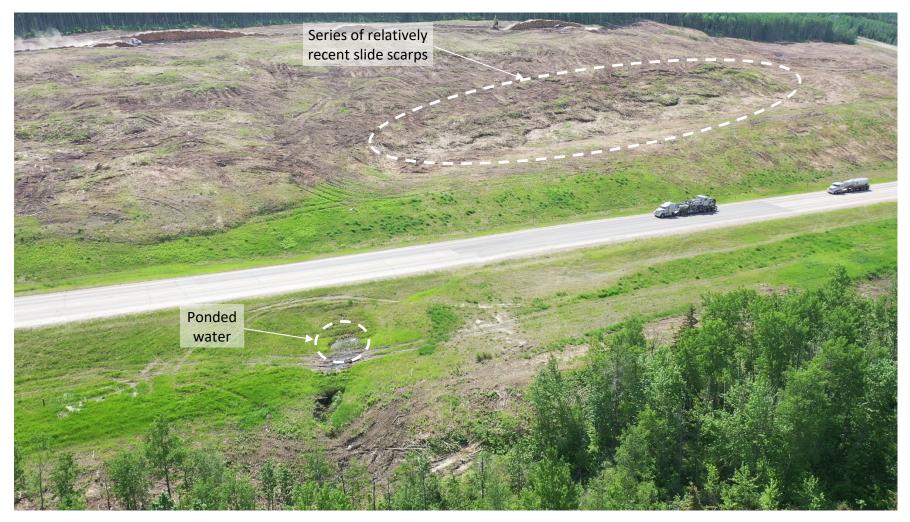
Erosion and slide (circled in white) at northern site limit just before bridge. Photo taken June 15, 2022, with UAV facing south.
